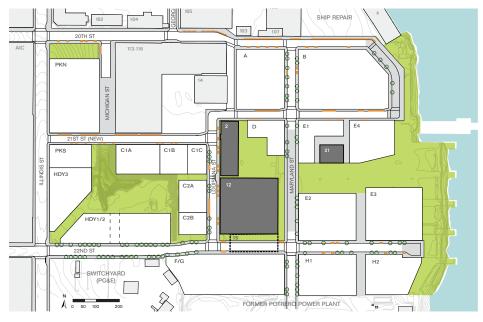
Illustrative Street Trees and Planting Concept Plan
